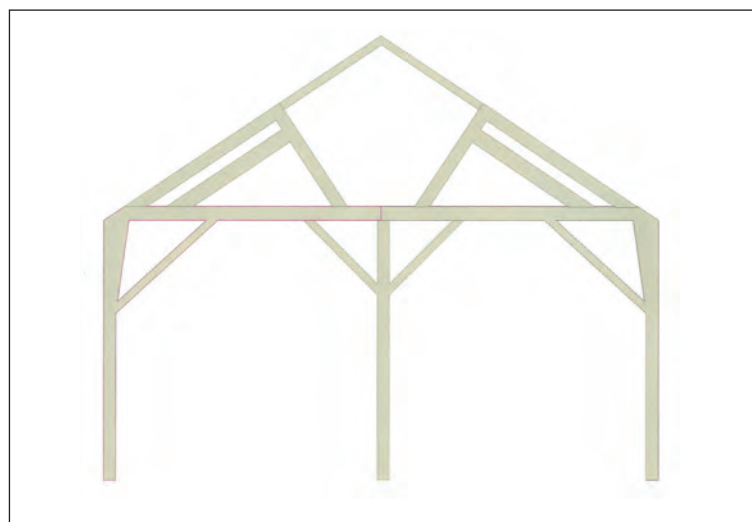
Cross-section of barn rebuilt as house frame on new site.
